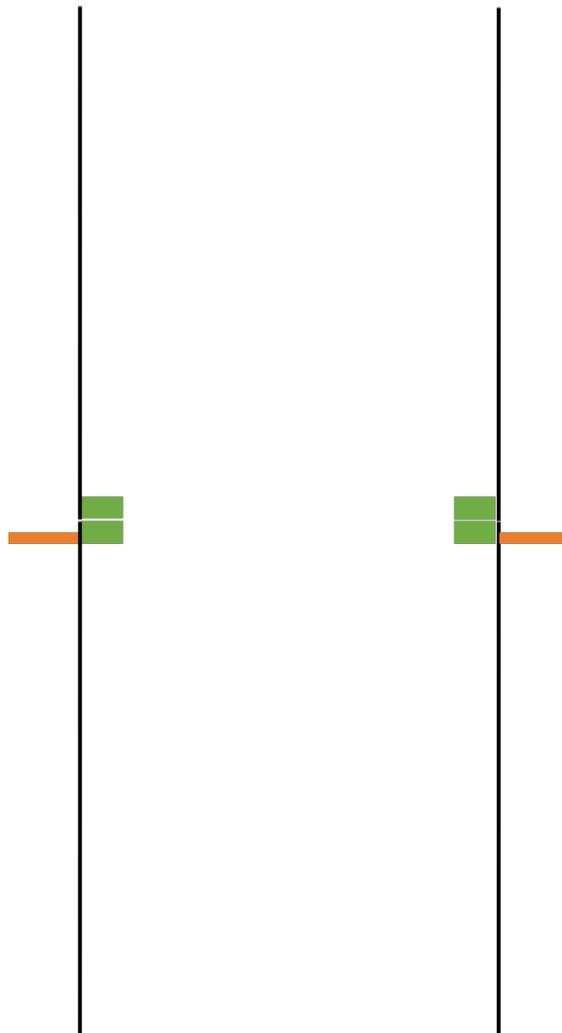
Cross-section of tower with flanges and a protruding edge on which a pinhole system can be attached.
